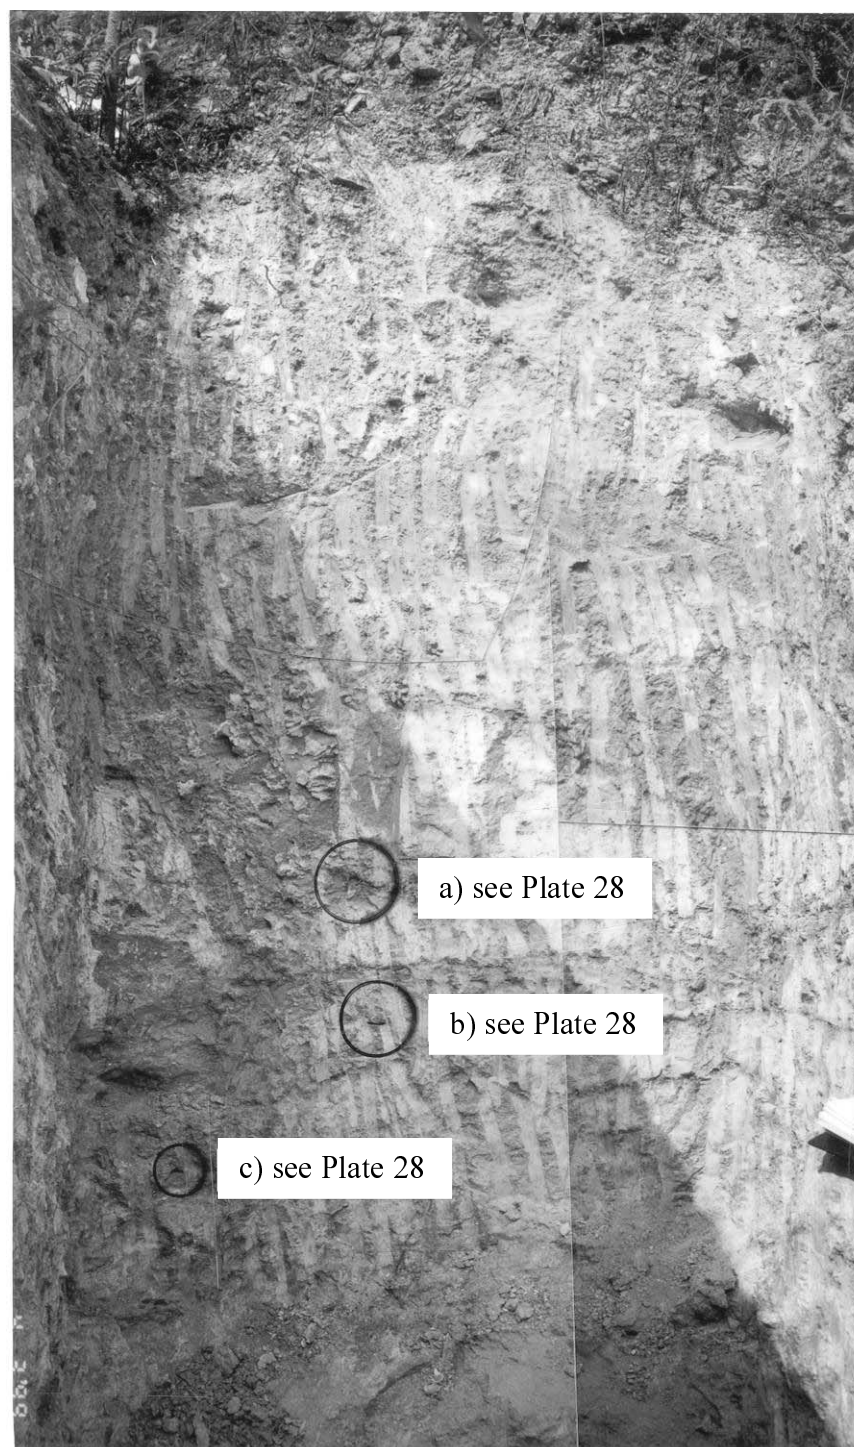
View of Face A, Trial Trench TT1, Showing Location of Voids/Soil Pipes within the C-HDT
